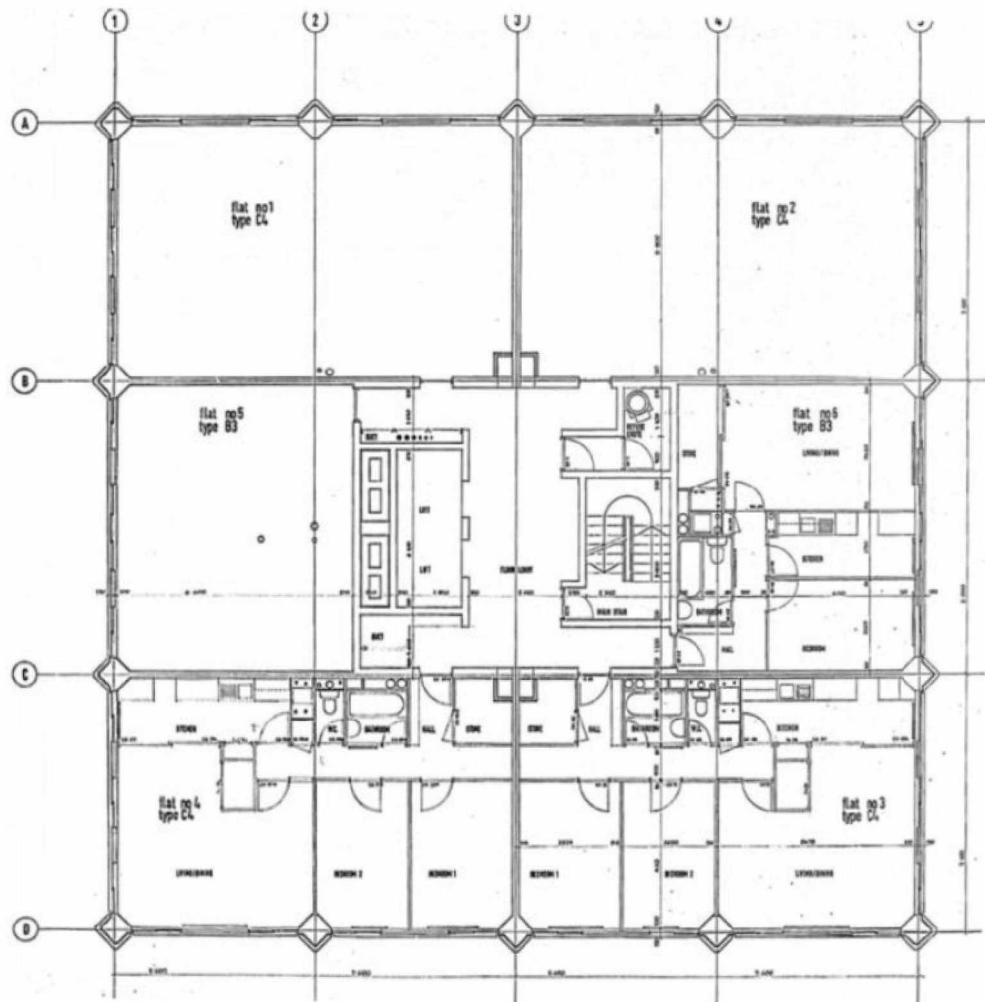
Original floor plan for residential levels 4 – 23. (RBK00018836)
